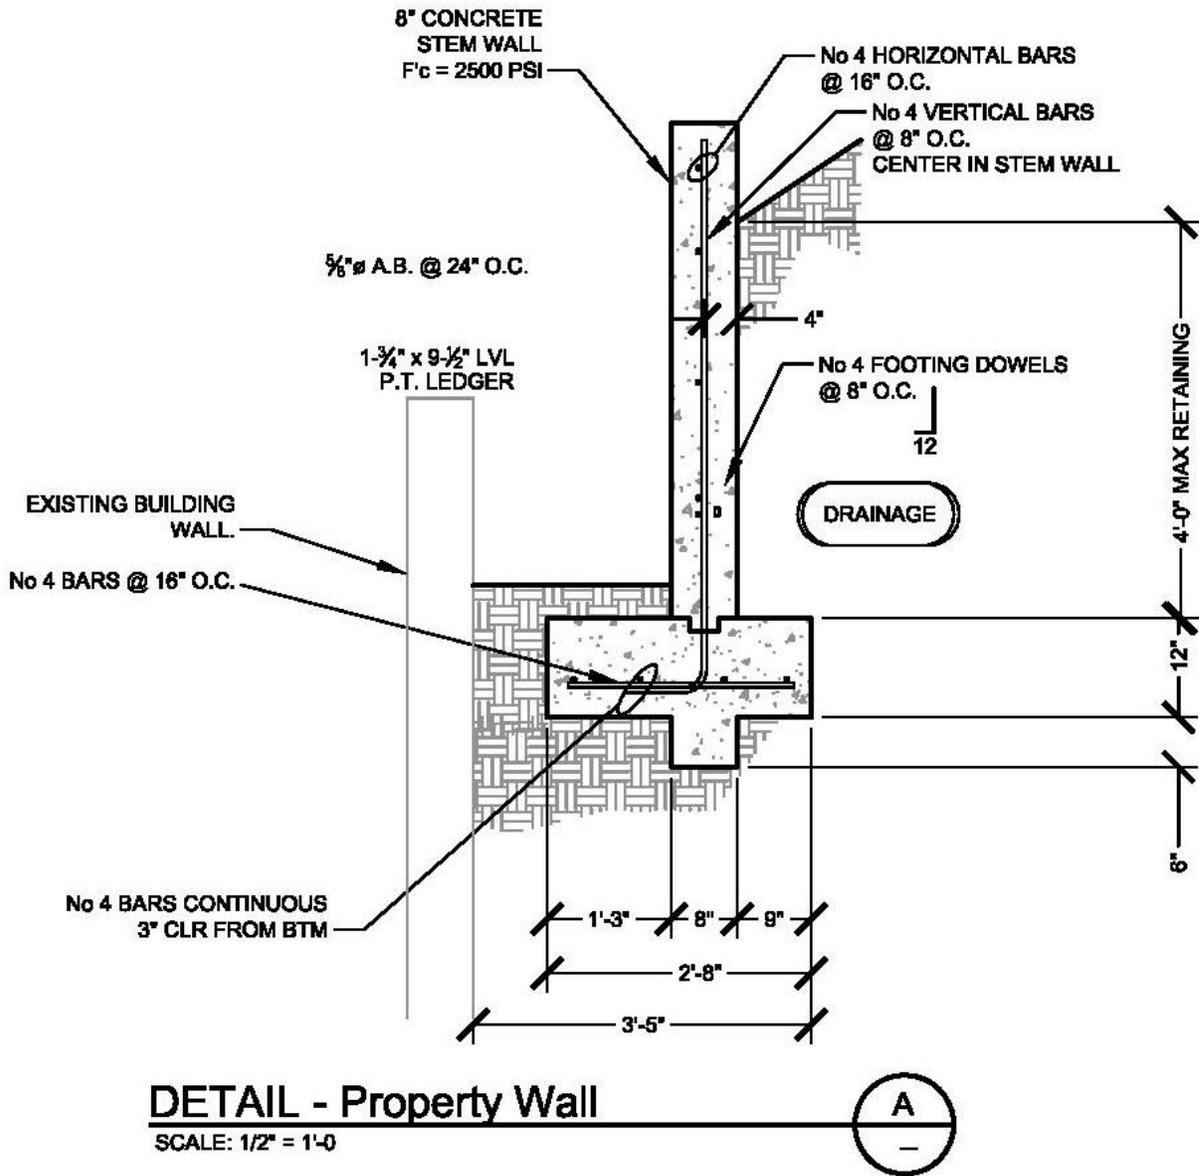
Proposed Retaining Wall, to be constructed at rear of both Winburn Way CC and Pioneer Log Cabin (Section), Snyder Engineering, 2021
